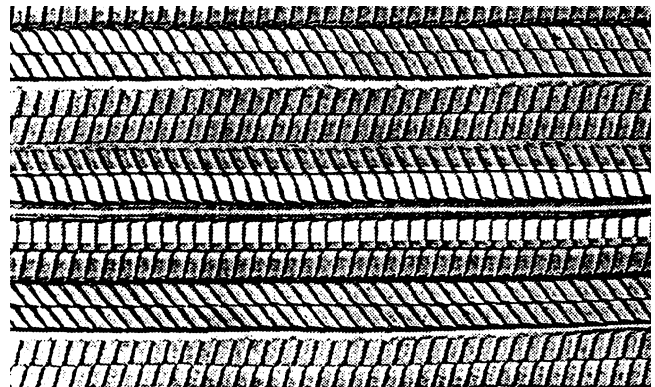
3/8 in. (9.5 mm) rib lath.
